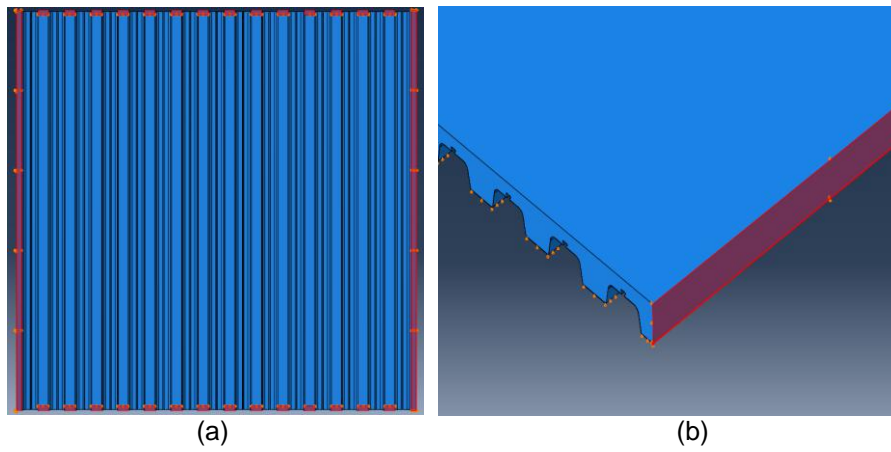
Simple connection between composite slab and supporting beams (a) concrete slab continuity in a fixed support model (b).
